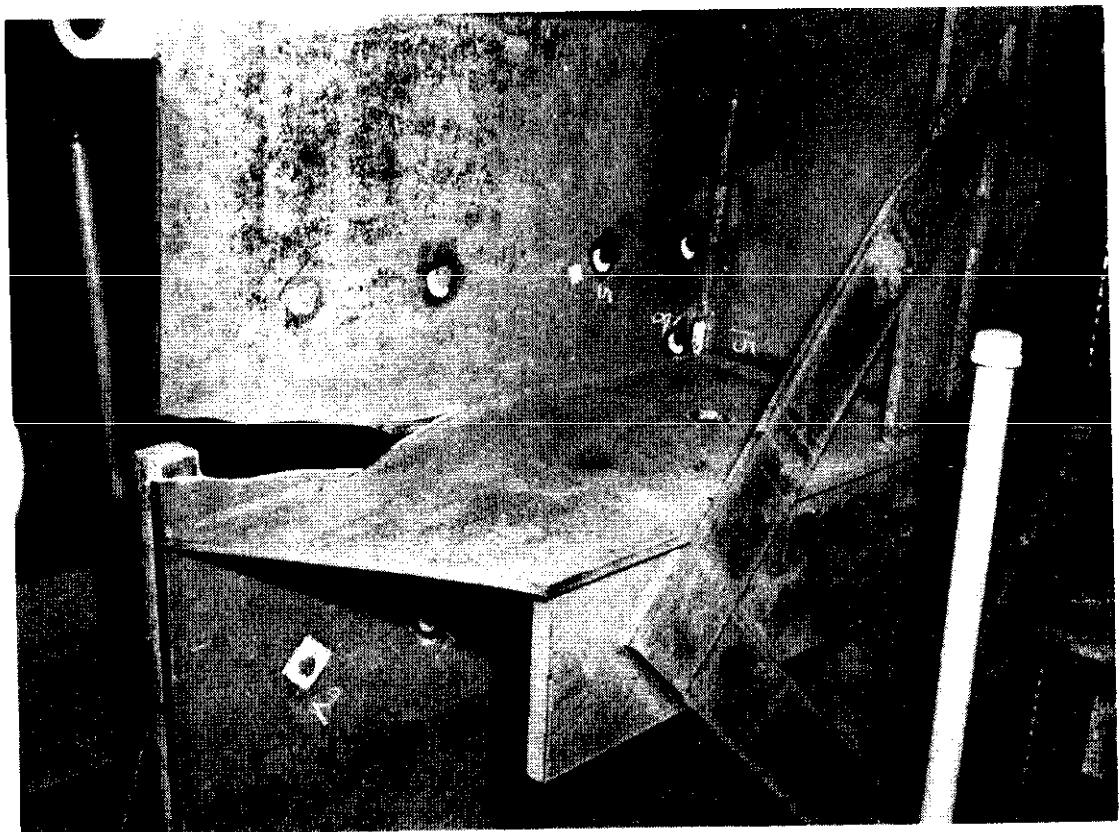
Specimen 31: View from below deck, outboard and aft of hatch end beam
